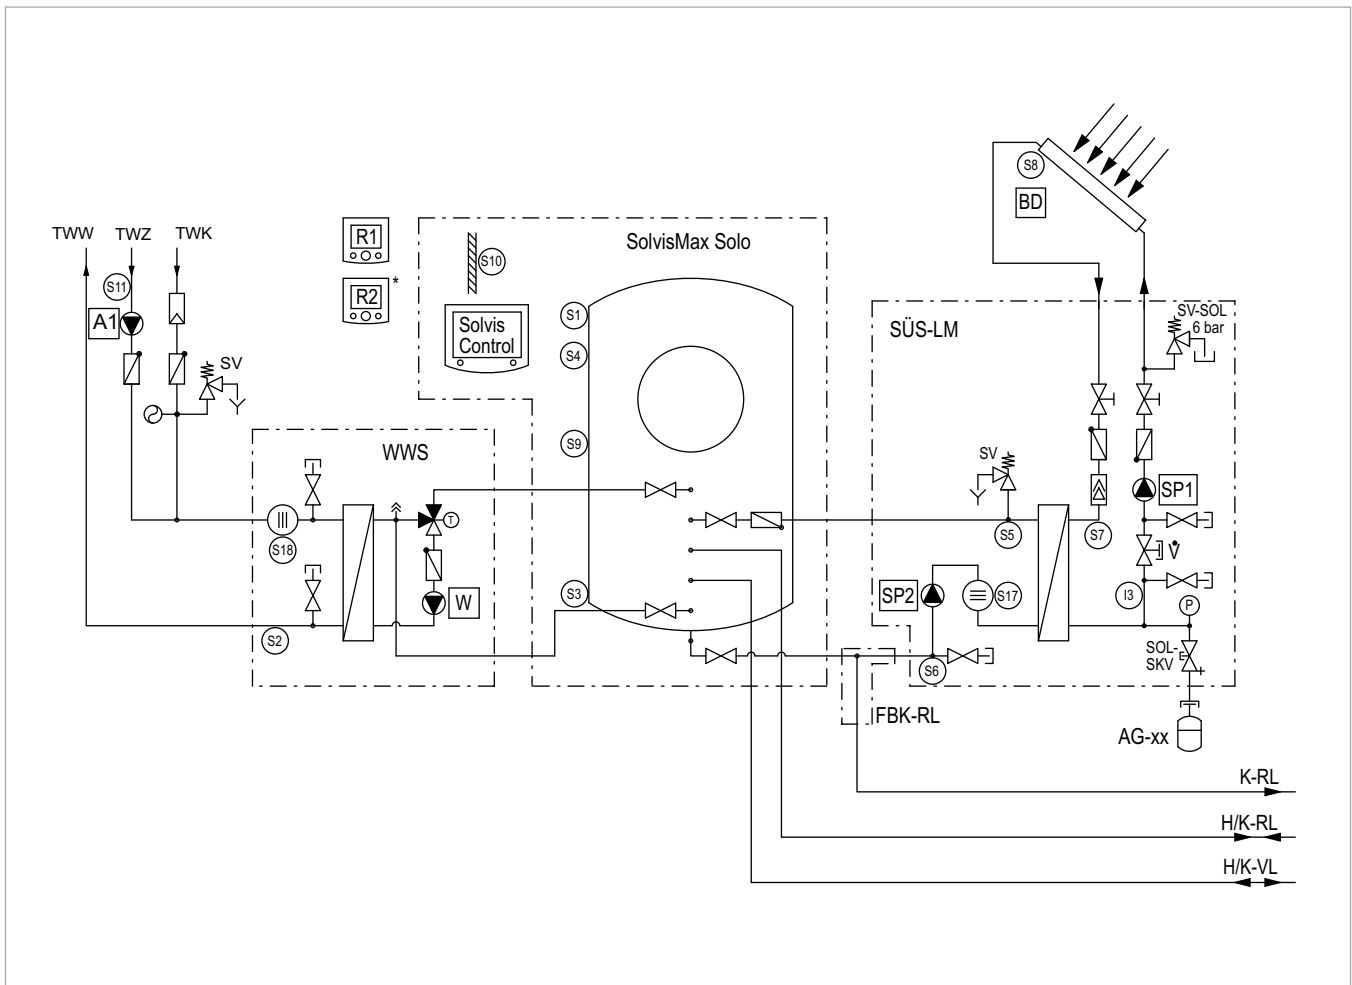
SolvisMax Solo with third-party boiler, solid fuel boiler and two mixed heating circuits – Part 1
